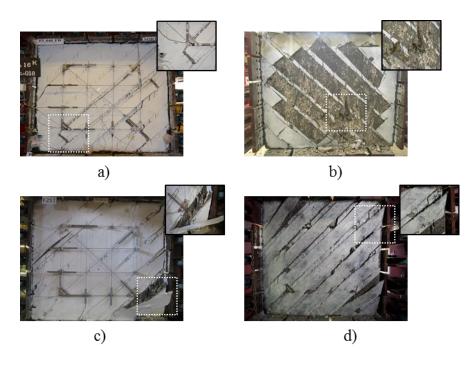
Different failure modes of panel specimens, a) FRP debonding, b) Concrete crushing, c) FRP anchor failure, d) FRP rupture
